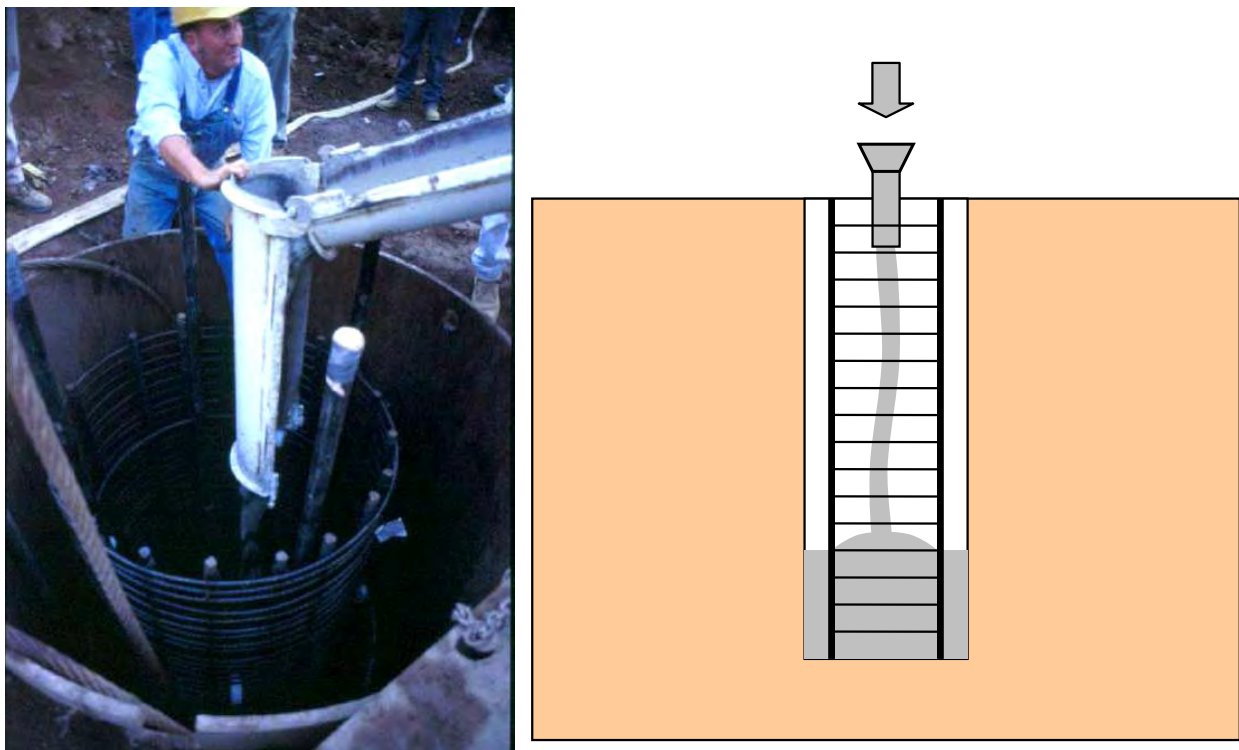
Free Fall Concrete Placement in a Dry Excavation
